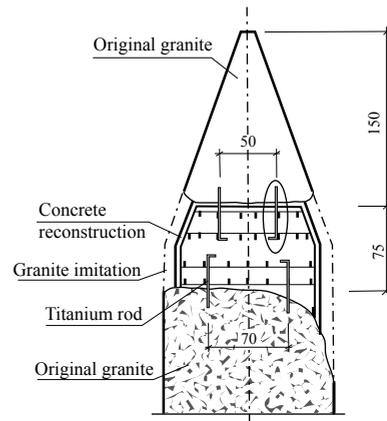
Details of the reinforcement of the reconstructed upper segment.
